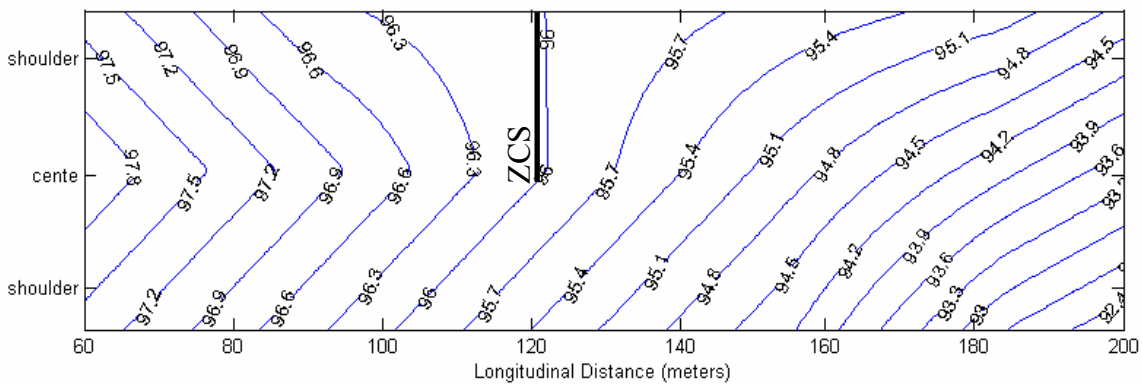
Contour plot of the surface elevation of a *Type-I* road (4-lane, $S_x=1.0\%$, ZCS at 122m station, elevation in feet).
